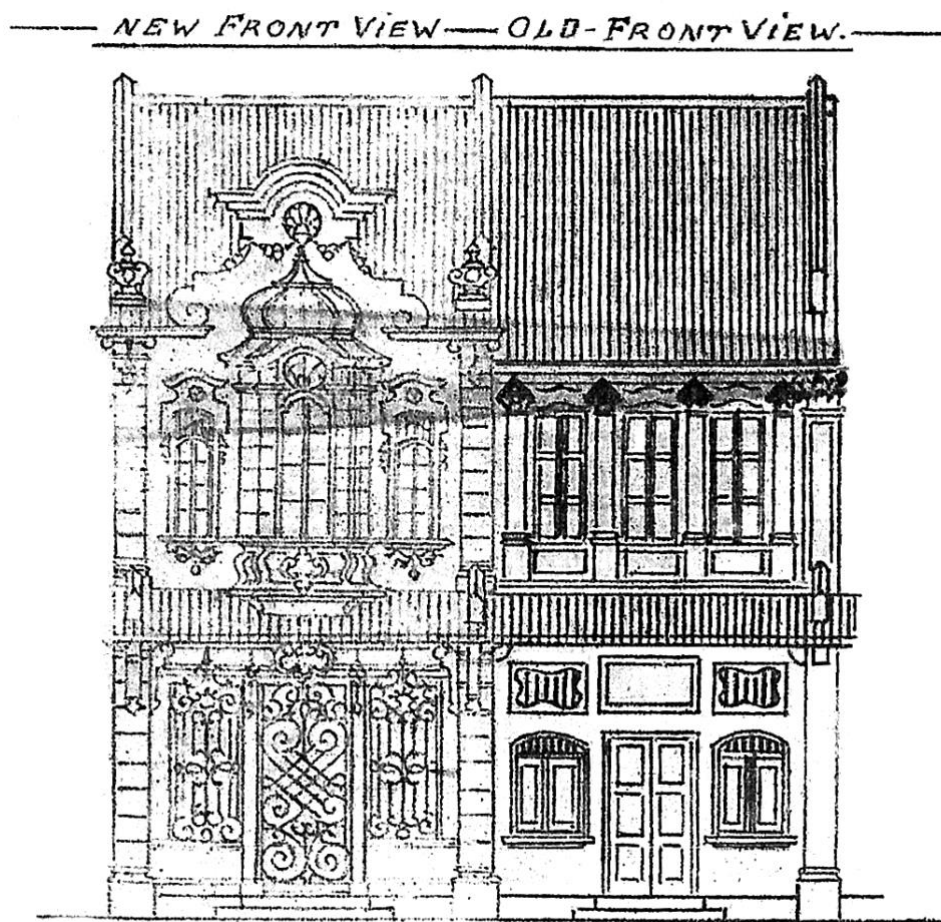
Paul Bernatz, *Remodelled house for Lo Gek Seng, 1911*. NAS CBS 128, *Building Plan* 365.
